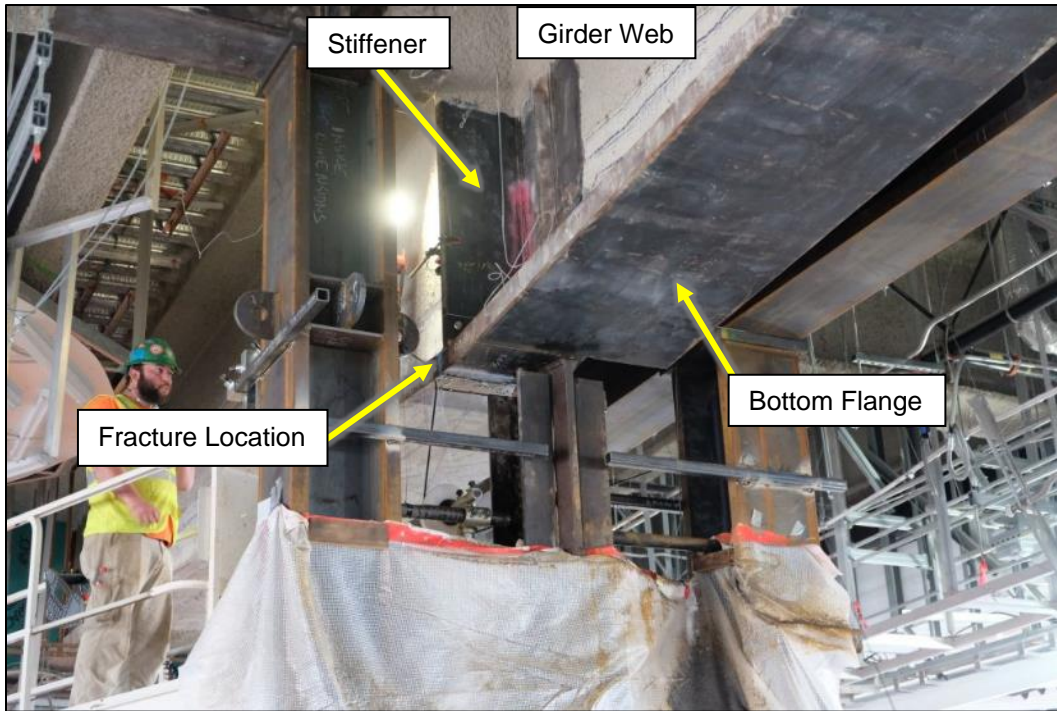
North side girder flange fracture location above Fremont Street.
